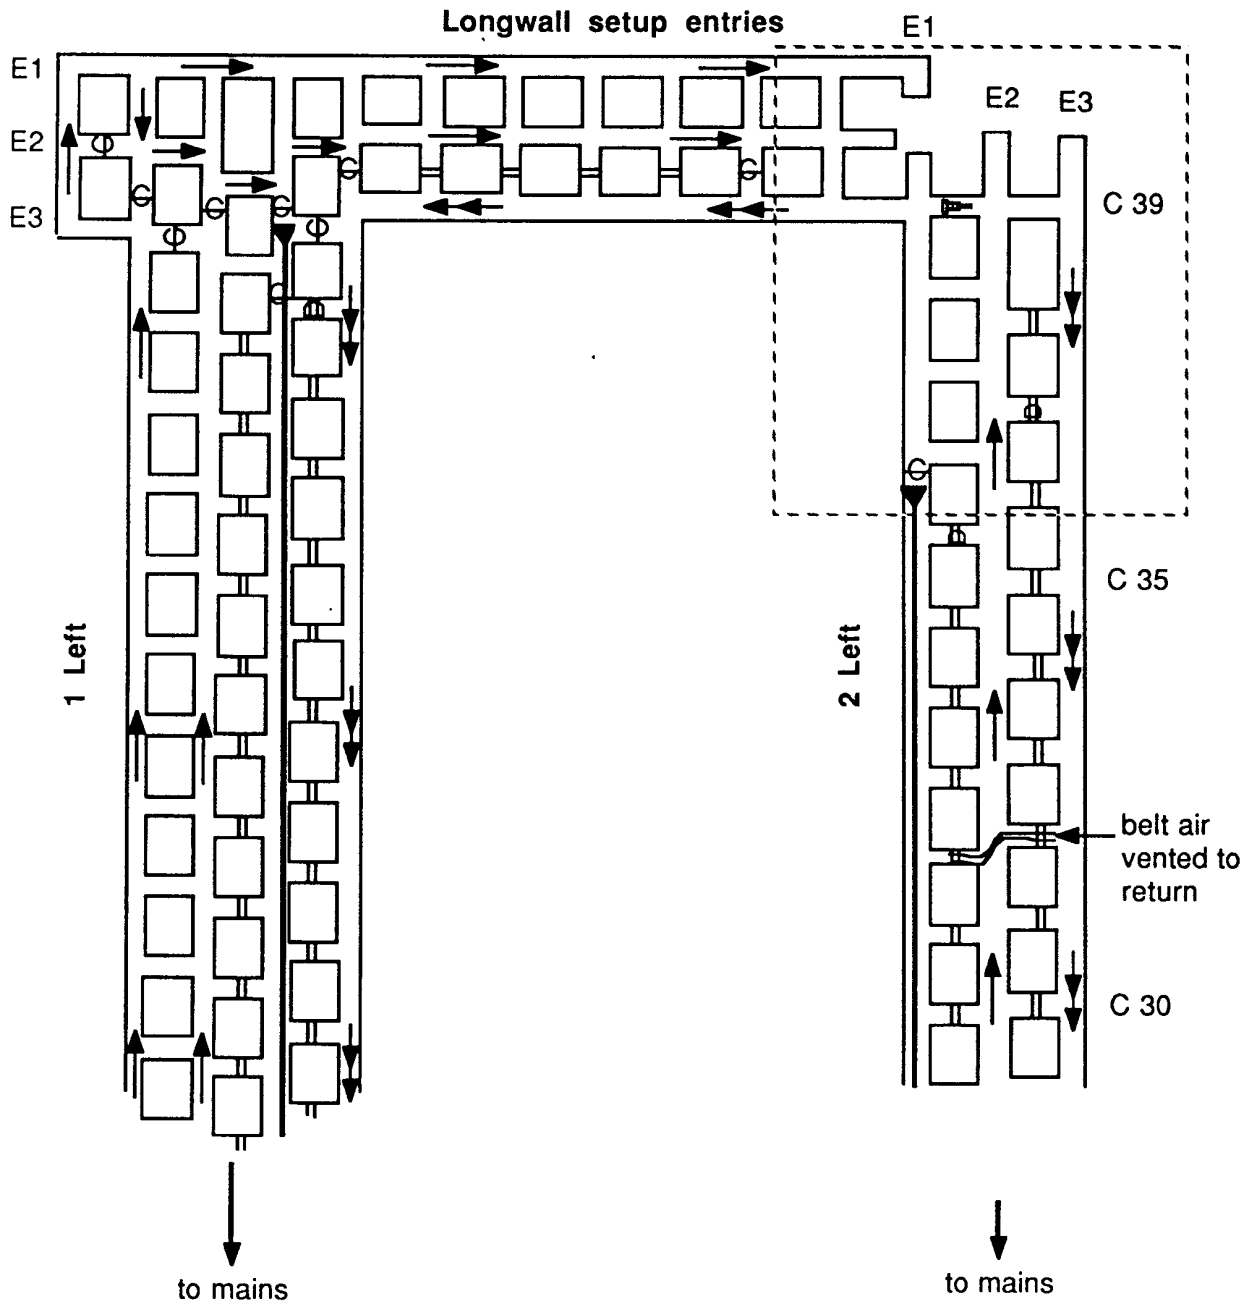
A: Sketch a good ventilation arrangement within the dotted line box
